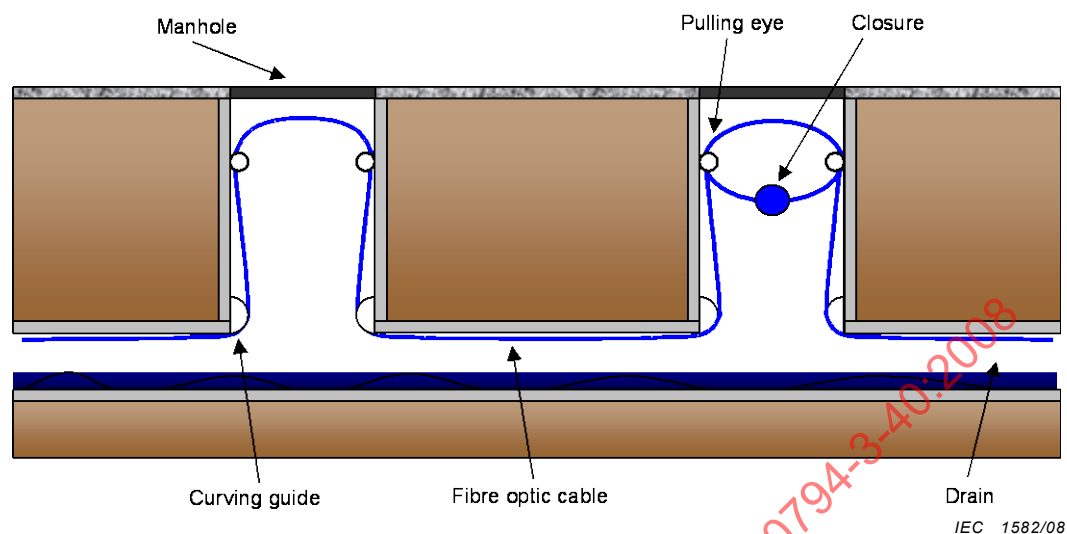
Schematic drawing – Spanning of optical fibre cables within sewers
